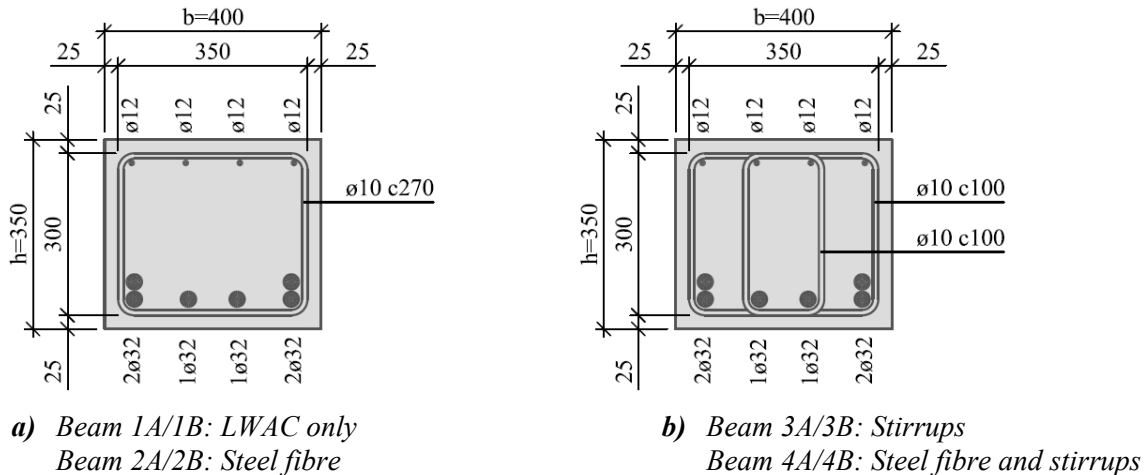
Reinforcement layout at mid span and dimensions (in mm)
